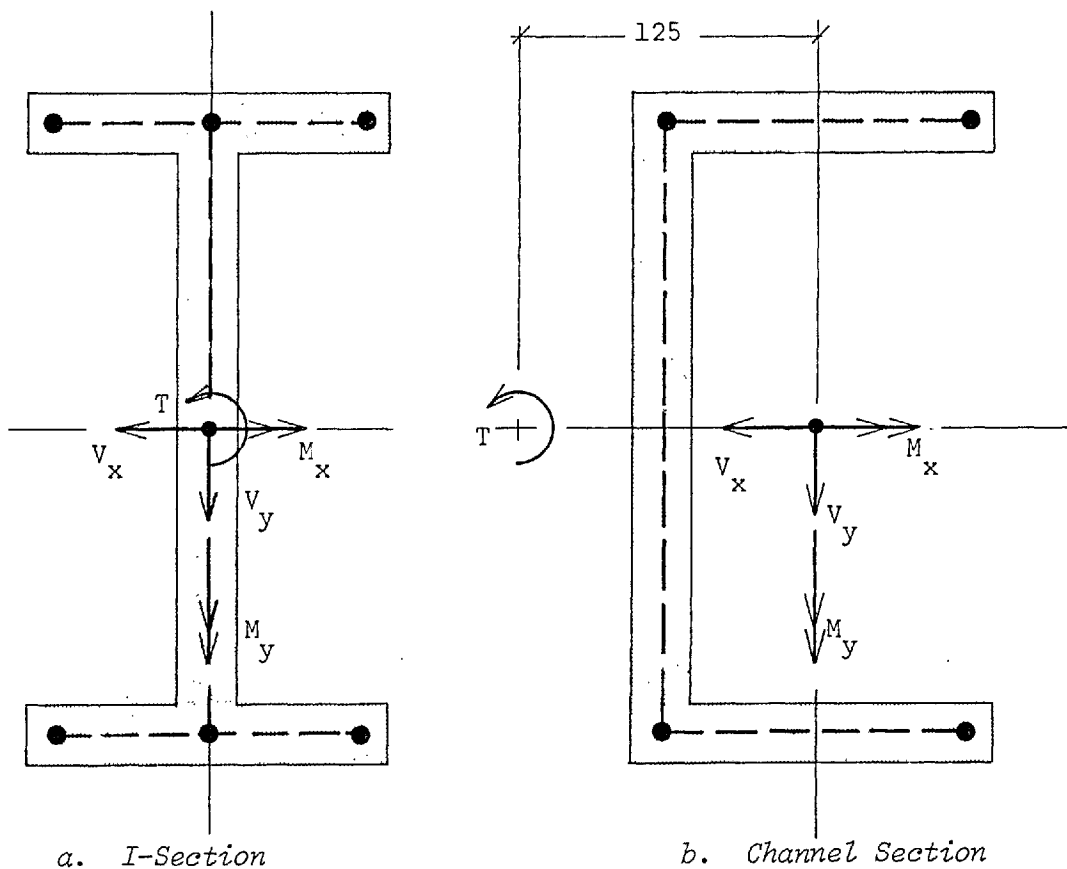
Idealizations of Open Section Beams adopted in the Advanced Failure Method
